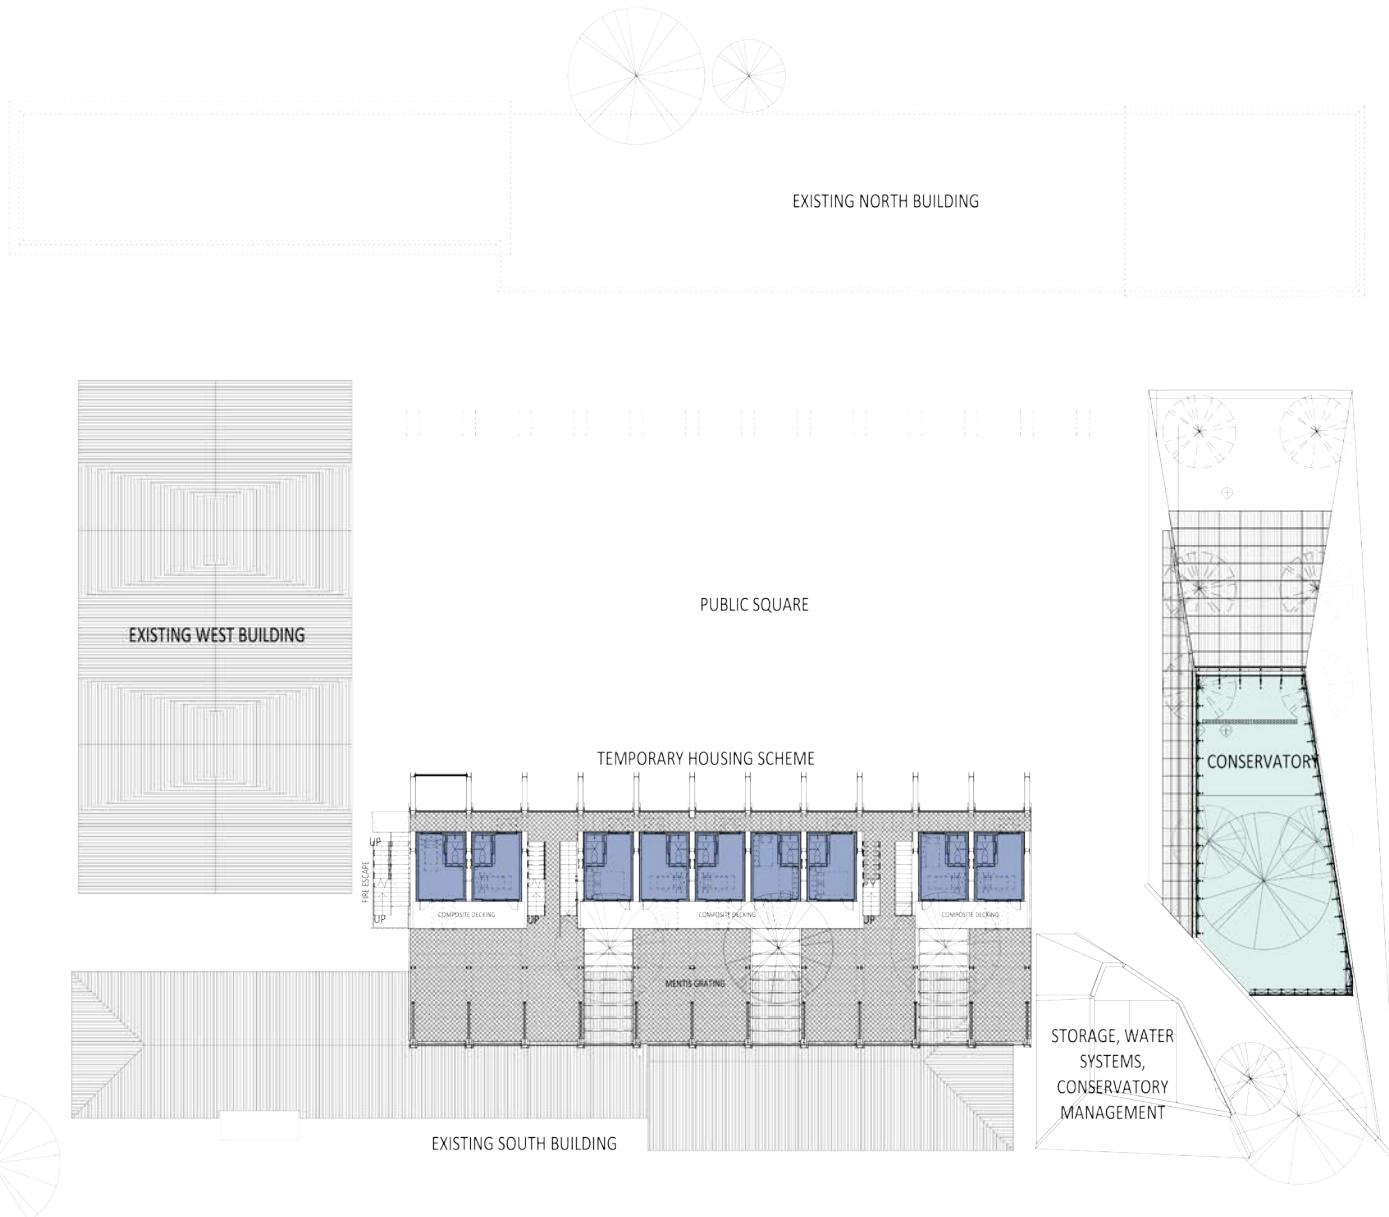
Second Floor Plan illustrating programmatic allocation
